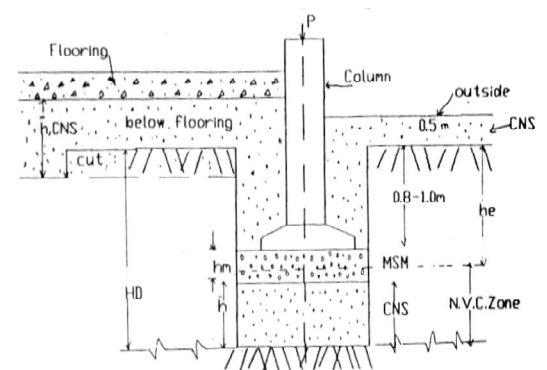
SHALLOW FOUNDATION WITH CNS &amp; MSM INTERCEPTING LAYERS
